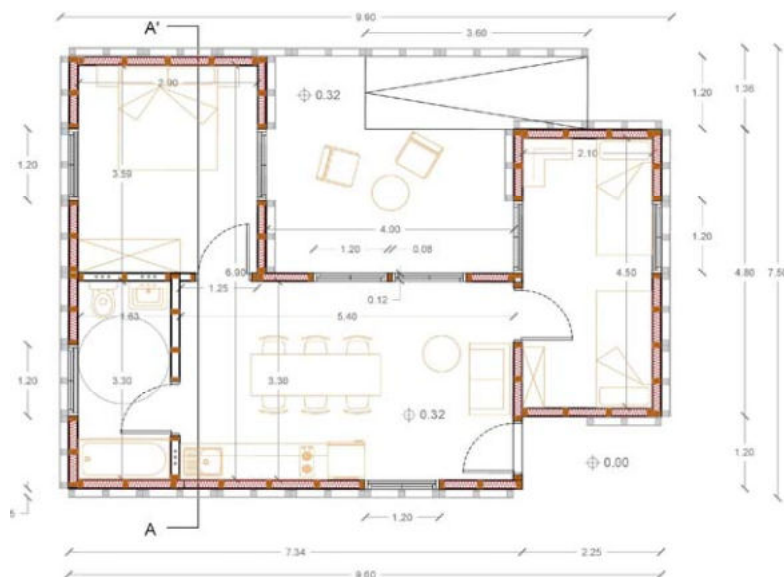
Pallet Shelter - Ground floor plan<sup>16</sup>
